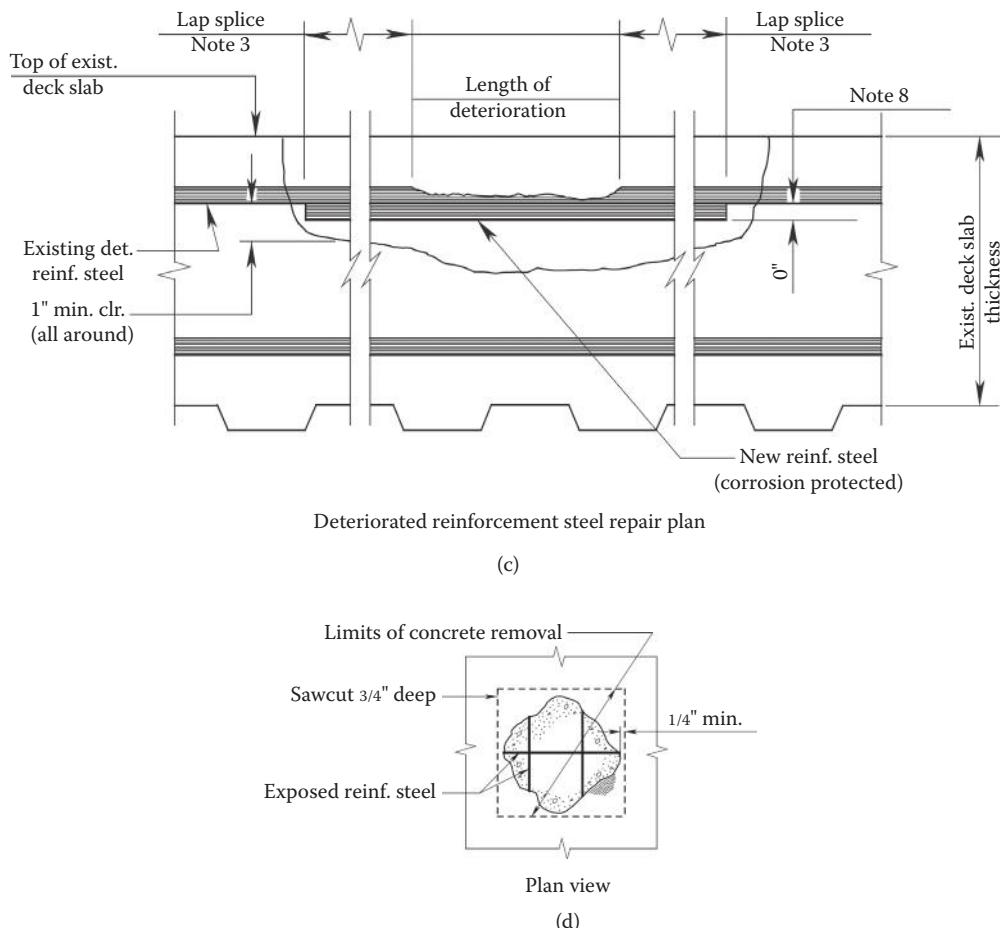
(Continued) Concrete deck repairs: (c) rebar repair and (d) limits of repair area.
